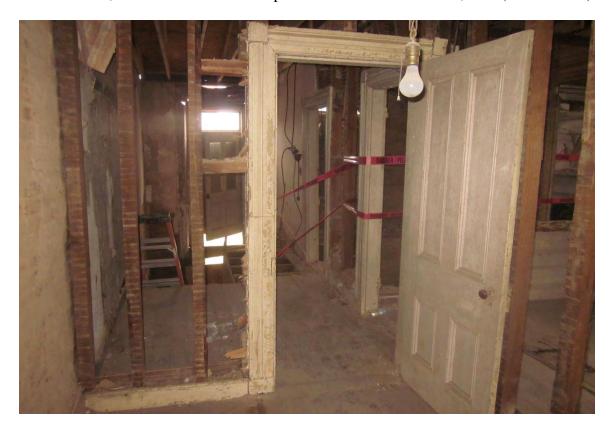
Interior Woodwork, beaded baseboard at 2<sup>nd</sup> Floor
